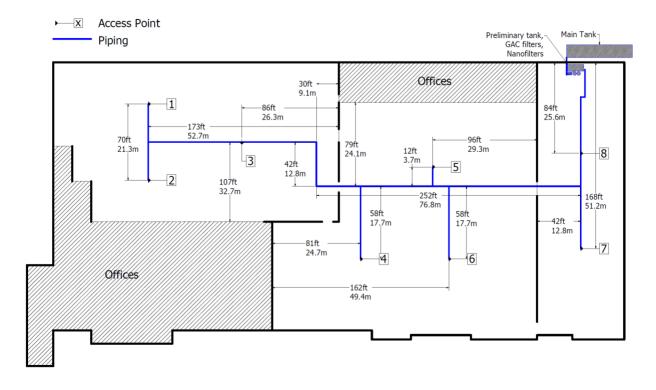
Piping Layout in Newterra Facility Layout of the proposed recirculation network
